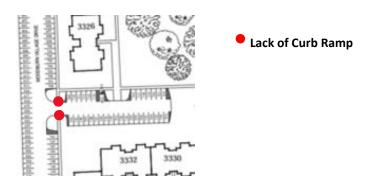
Example of Lack of Curb Ramps at parking lot intersections.
